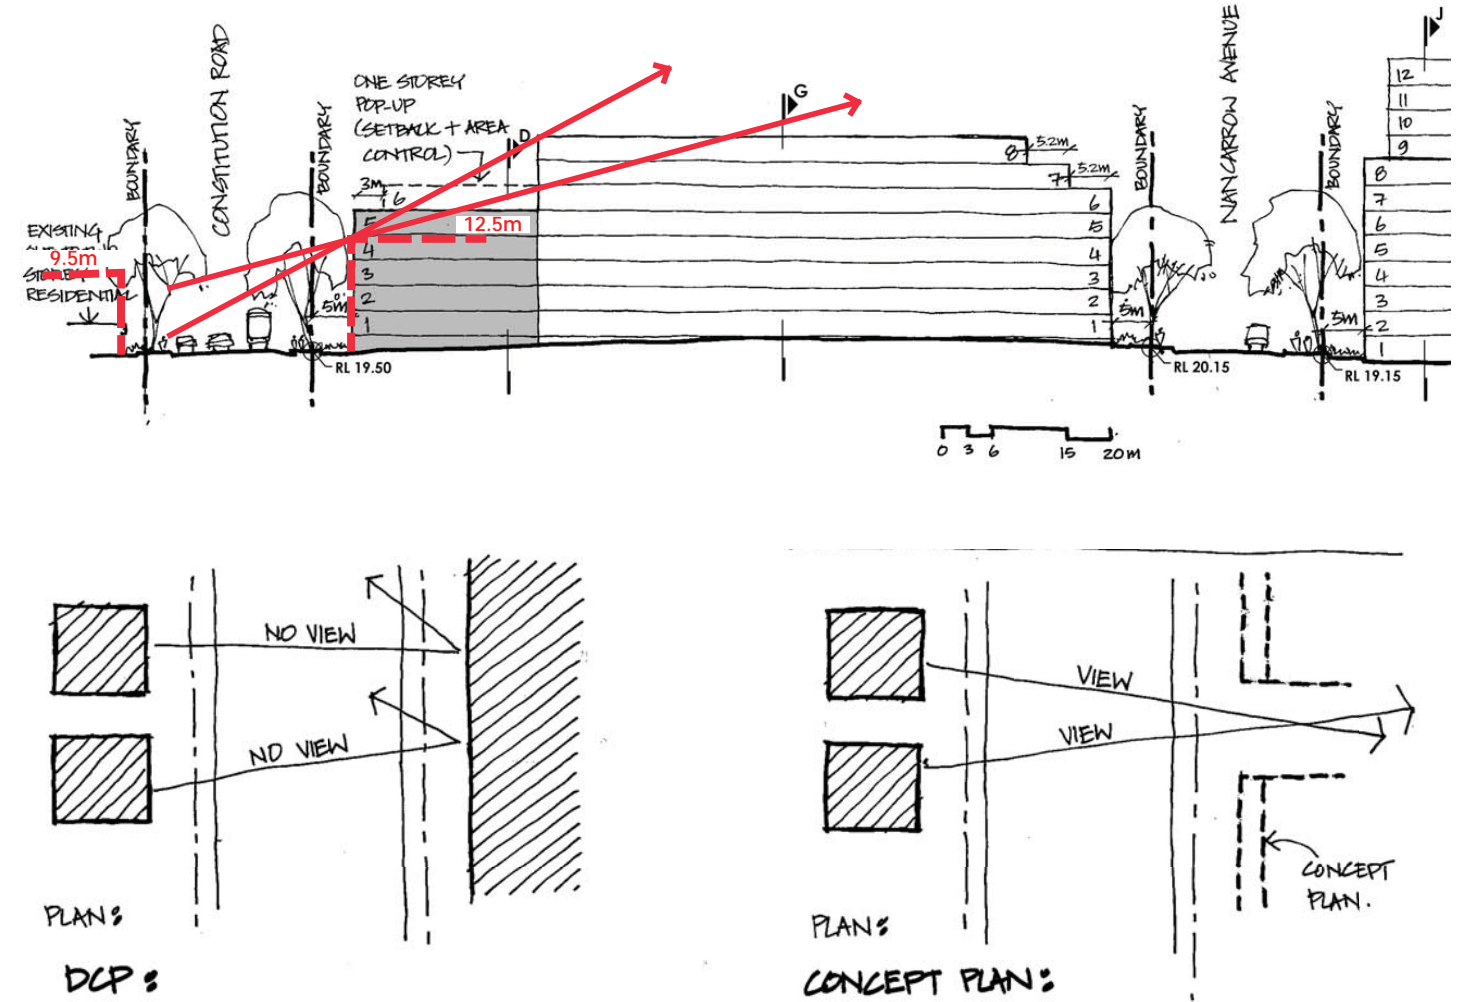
LEP/DCP COMPLIANT HEIGHTS AND BUILDING FOOTPRINTS COMPARISON WITH CONCEPT PLAN ON CONSTITUTION ROAD
